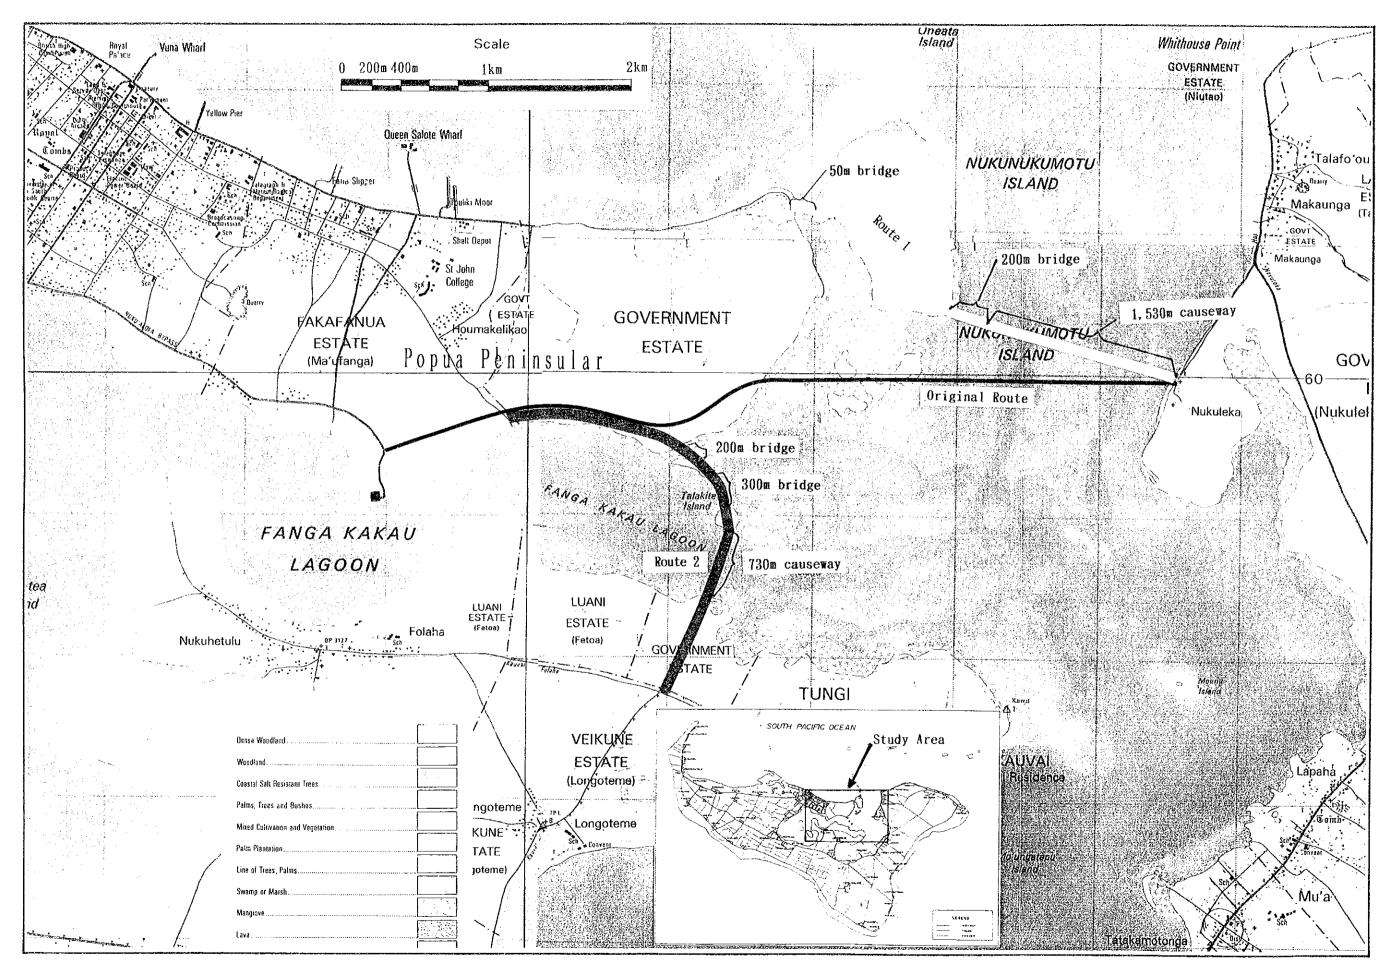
2-2 LOCATION OF CAUSEWAY ROUTES
